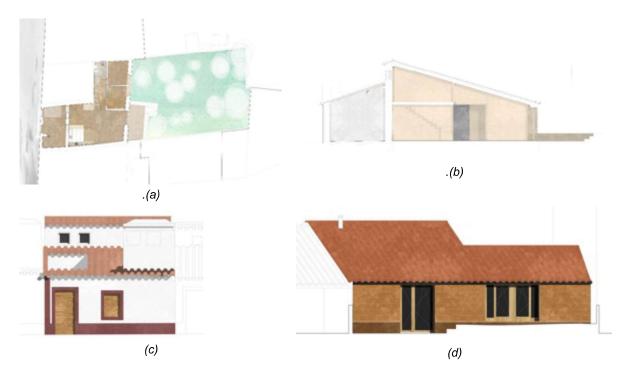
(a) Ground floor plan, (b) section (c) East facade and (d) West façade of the Ruinha House
